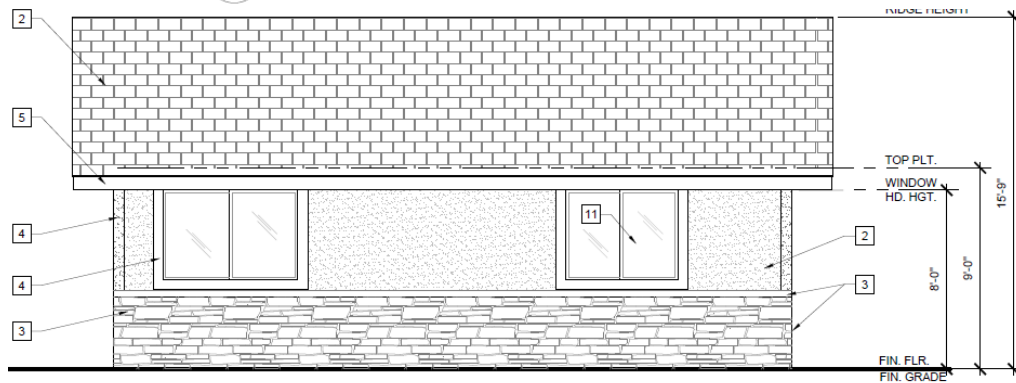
Building Elevations- Office Building (full size sheets in application package)
